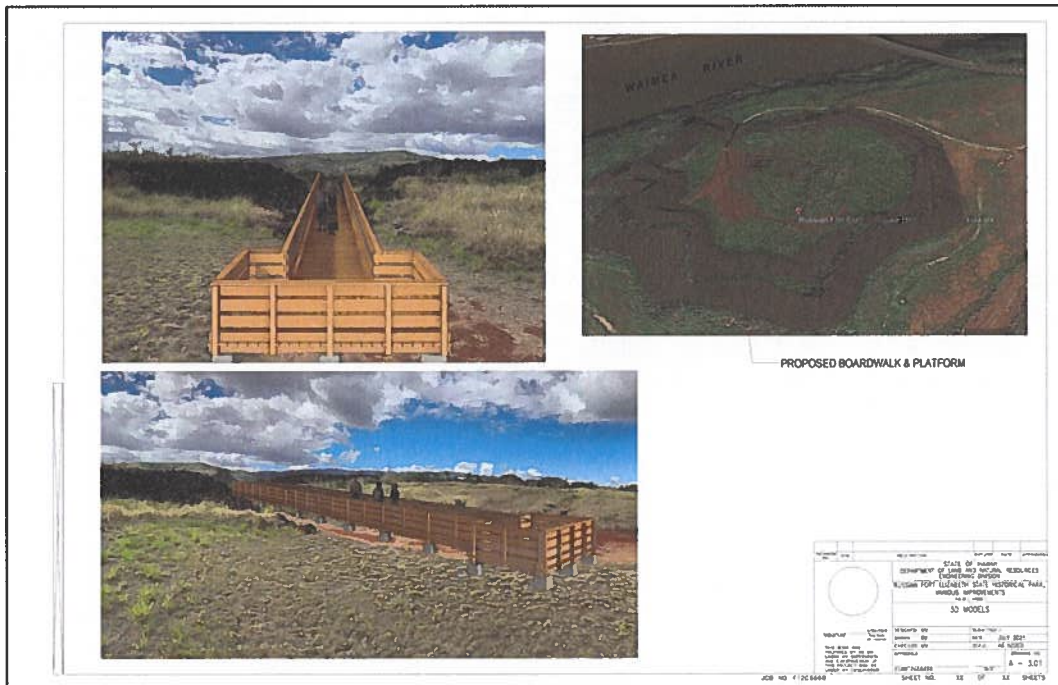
Artist renderings of the boardwalk and viewing platform which extends through the entry in the fort wall and into the fort interior.
